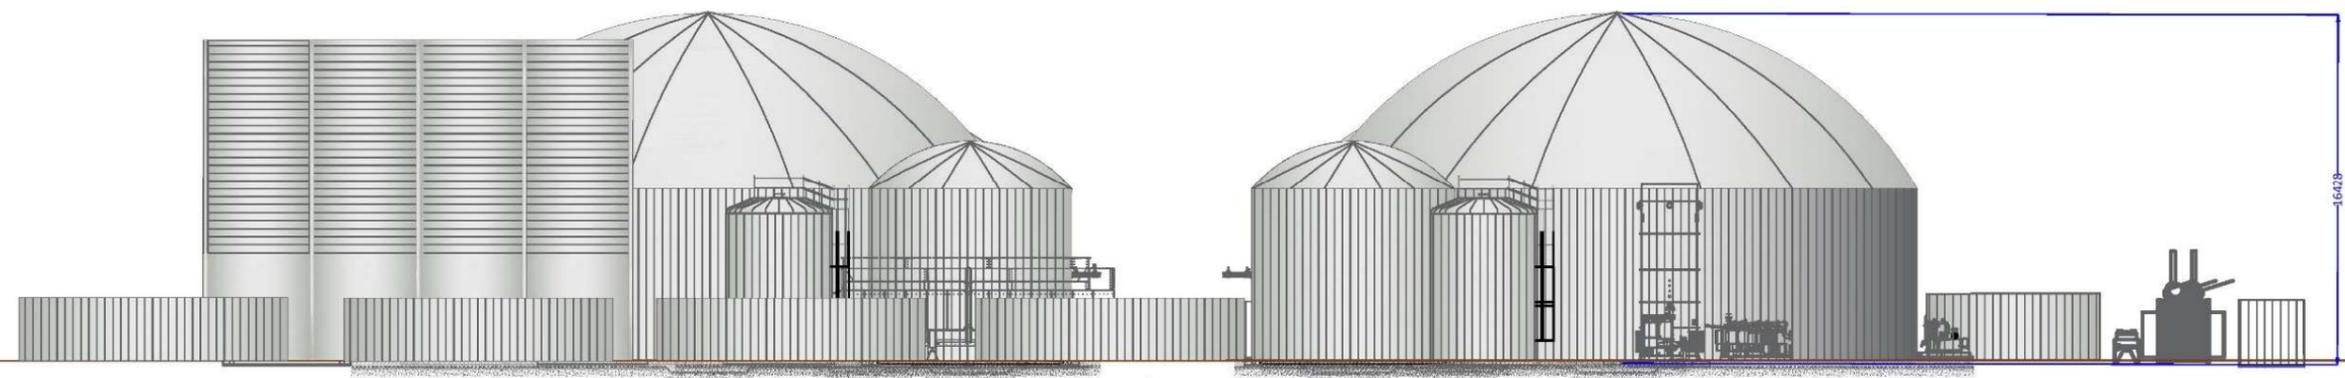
Site layout and elevation: Western perspective of the Proposed Fertiliser Facility
